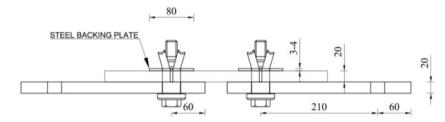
Blind-bolted connectors in steel-FRP single-lap shear joint specimens (dimensions in mm).
